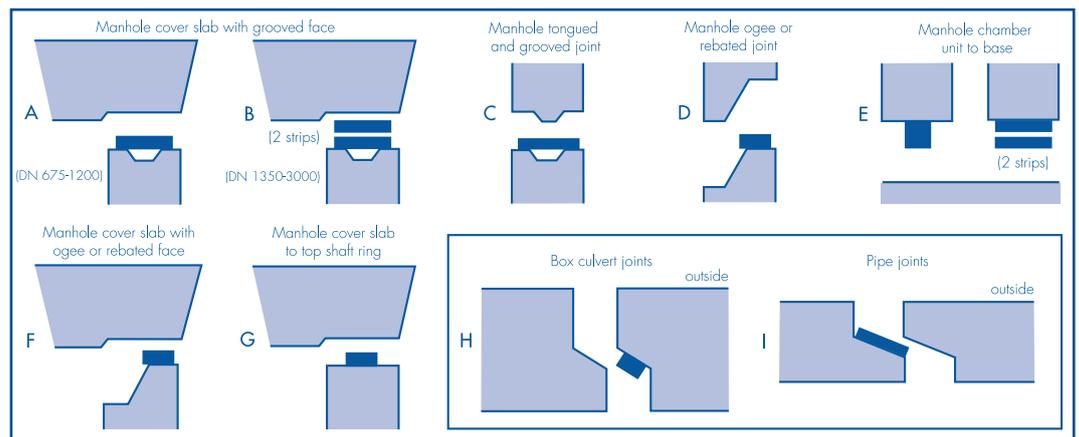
Correct Densostrip position shown in cross section for sealing manhole, box culvert and pipe joints
